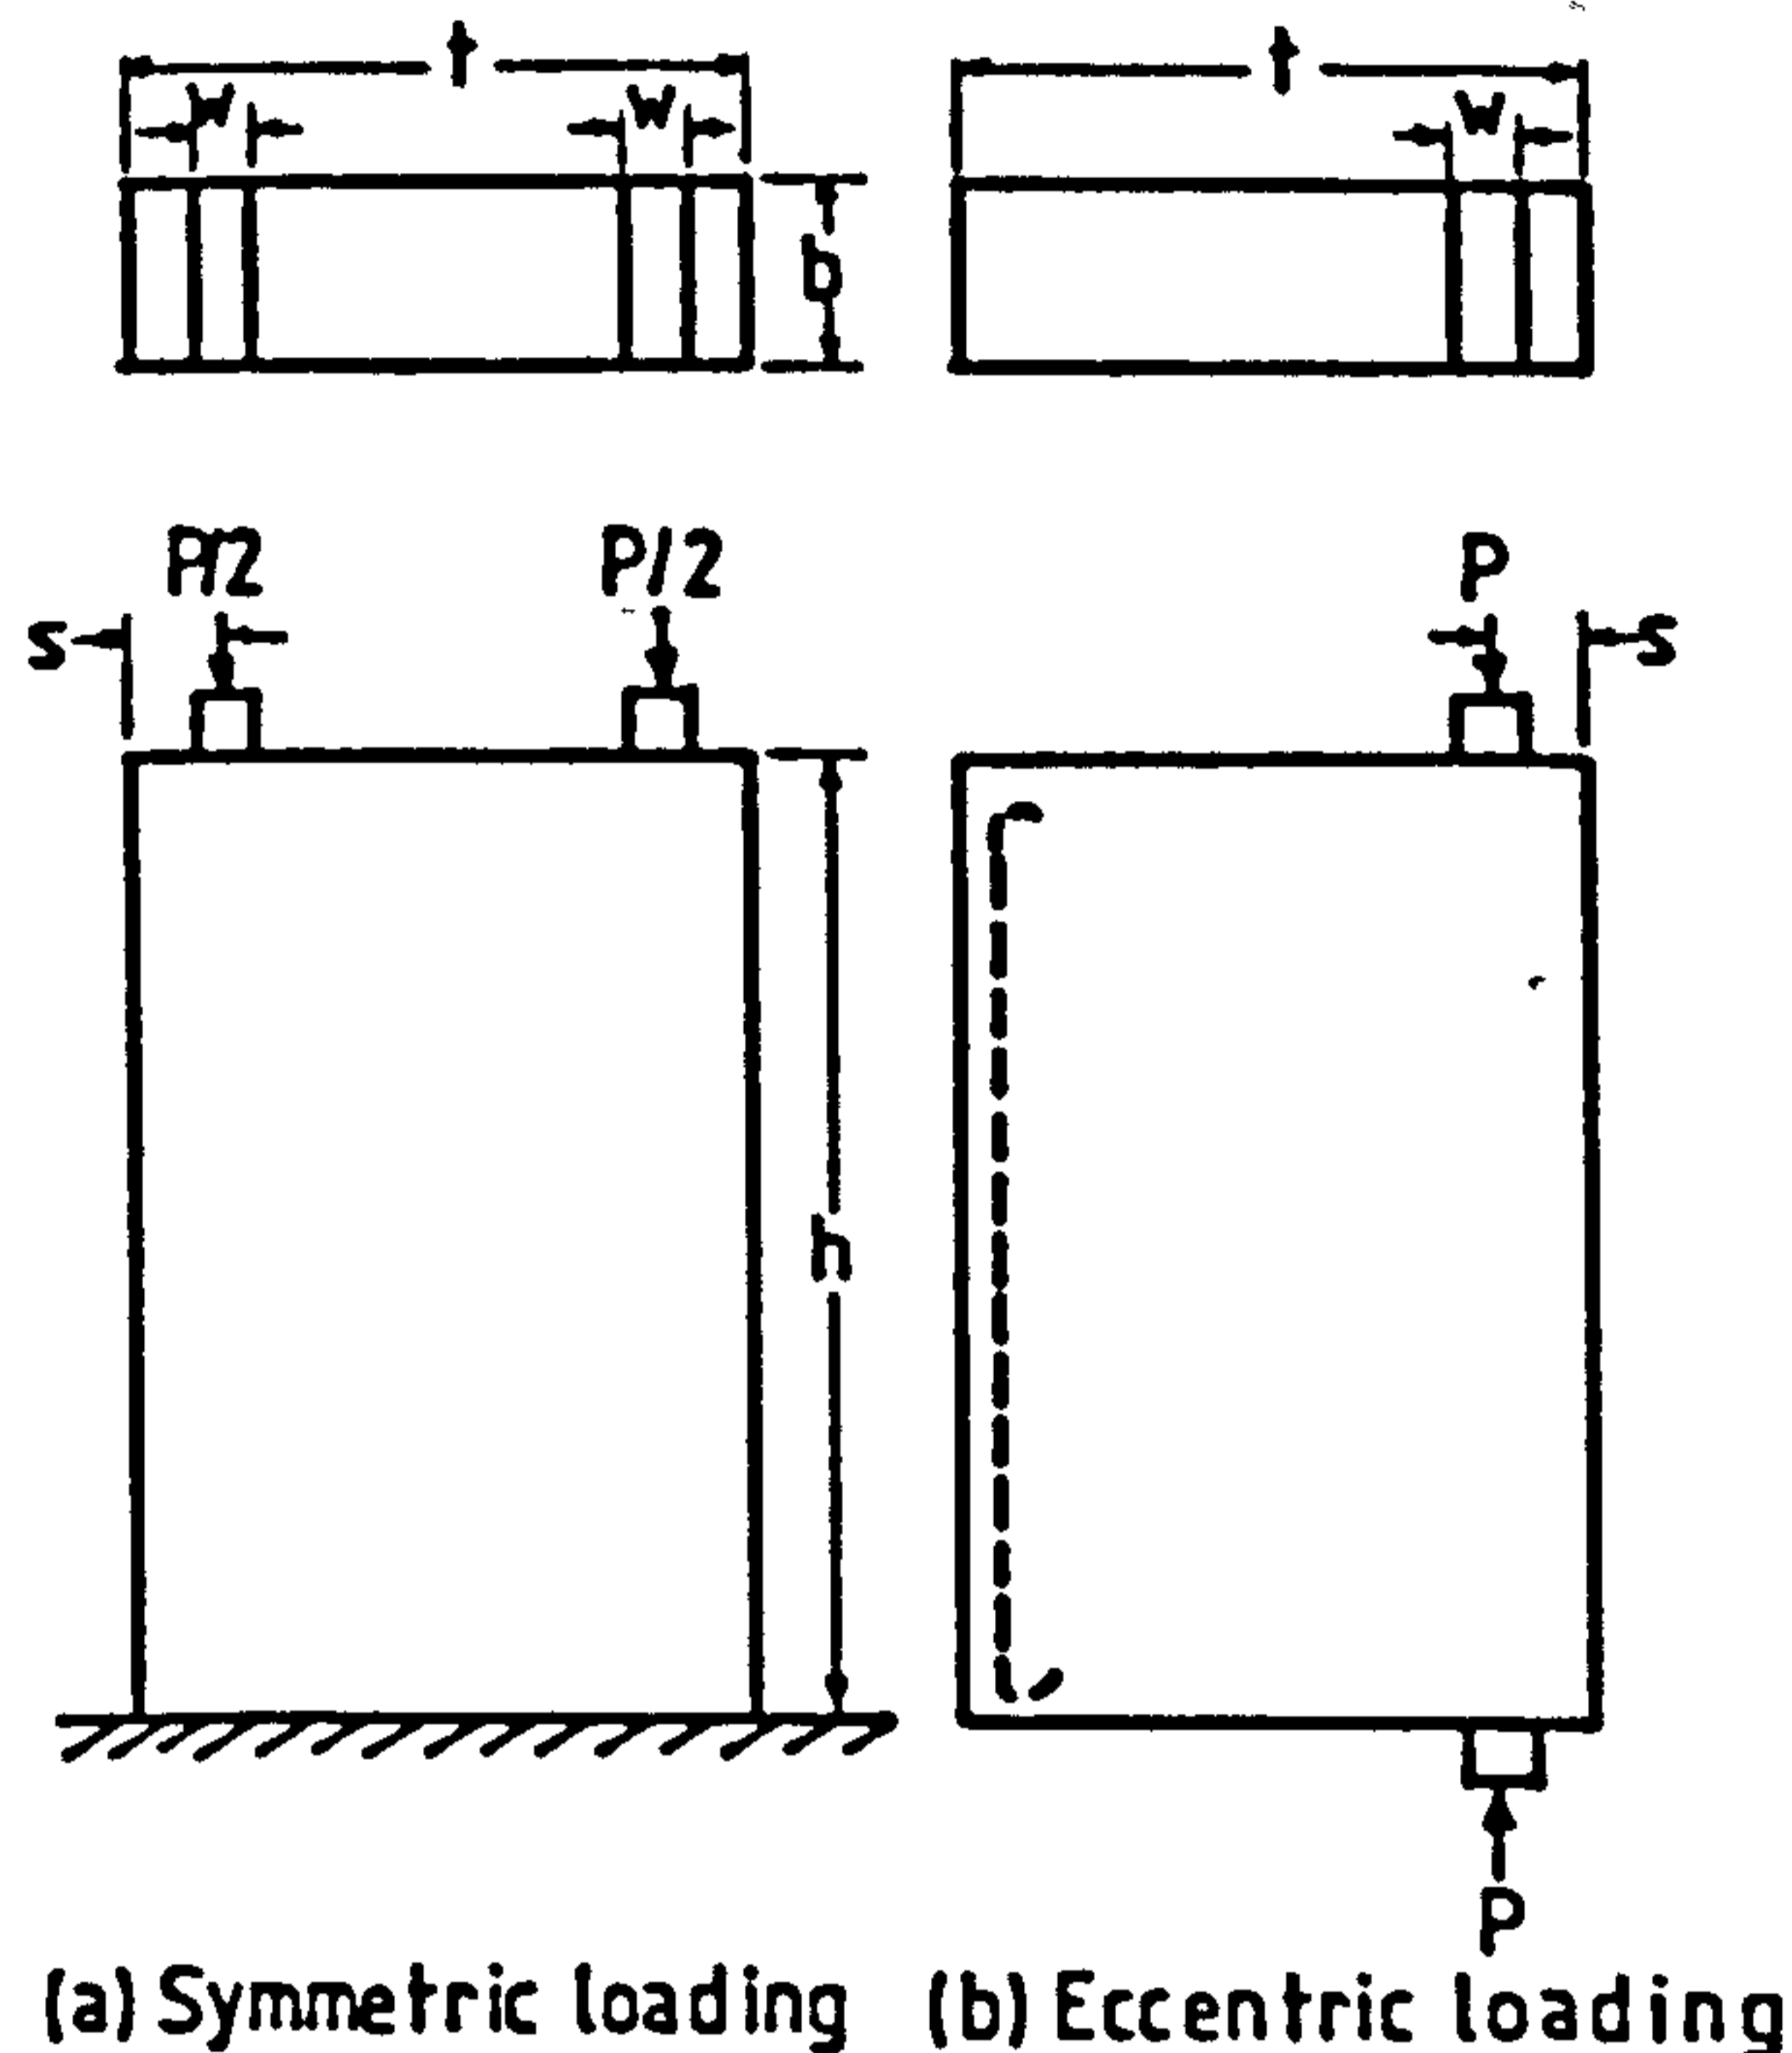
Cross-sectional dimensions for test specimens (Hawkins, 1970)
